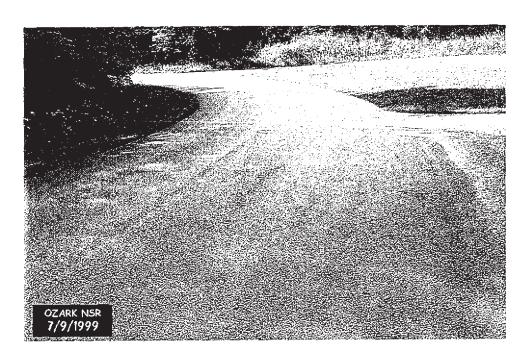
Route 015, Typical Pavement Section in Curve of Road.
